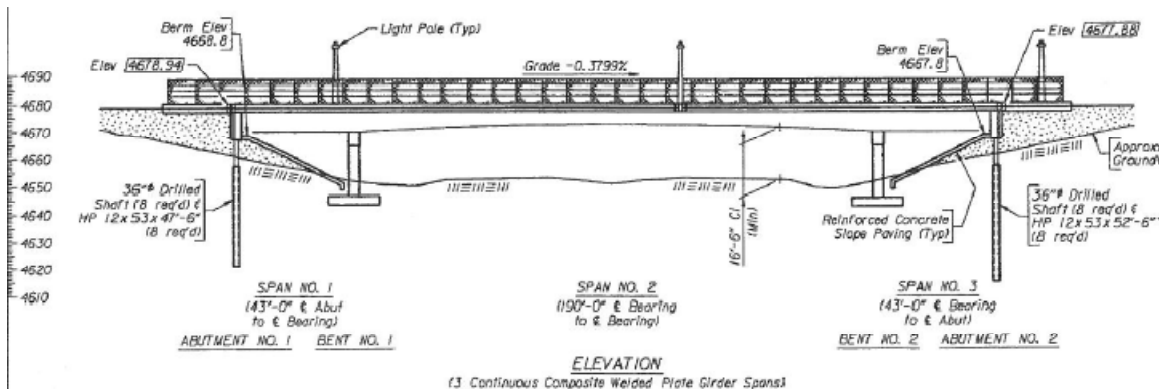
Elevation view of bridge at Burma Road Overpass (WYDOT 2008)
